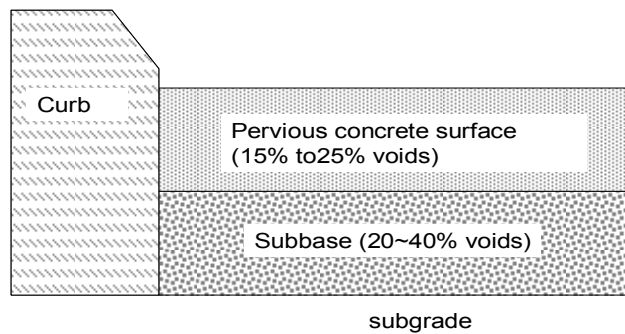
Typical cross-section of pervious concrete pavement, after Tennis et al. (2004).
